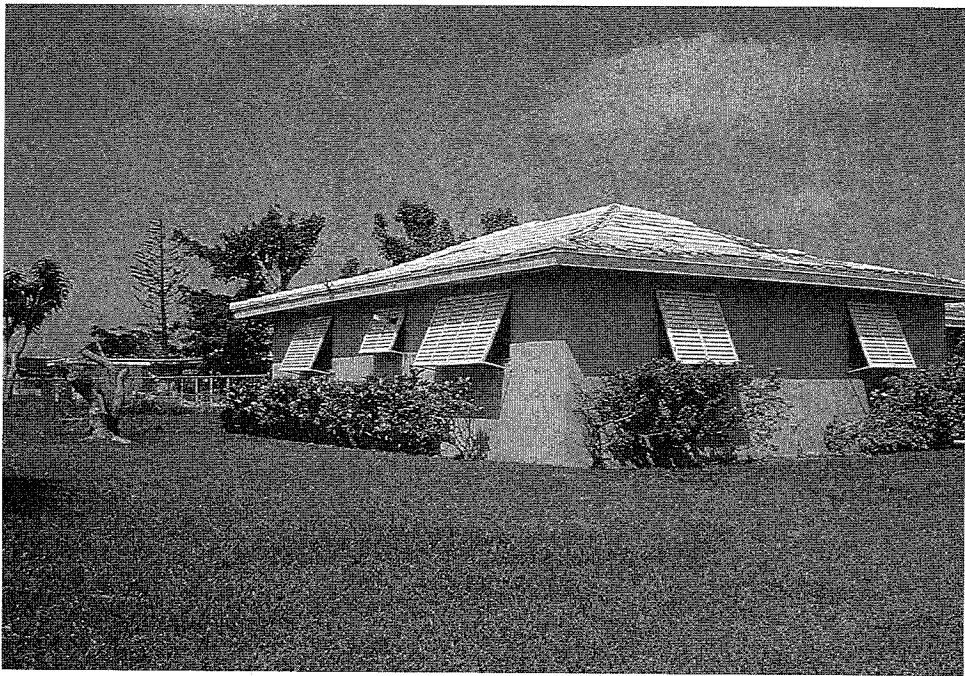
Simple hurricane shutters provided adequate window protection for this home. Water damage was minimal.
